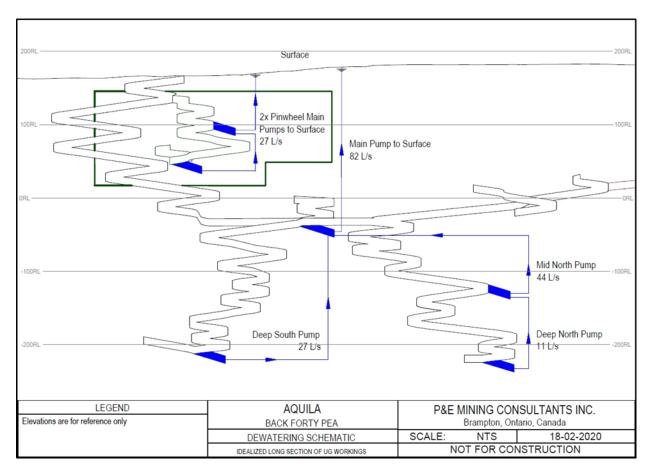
UNDERGROUND DEWATERING SYSTEM SCHEMATIC
